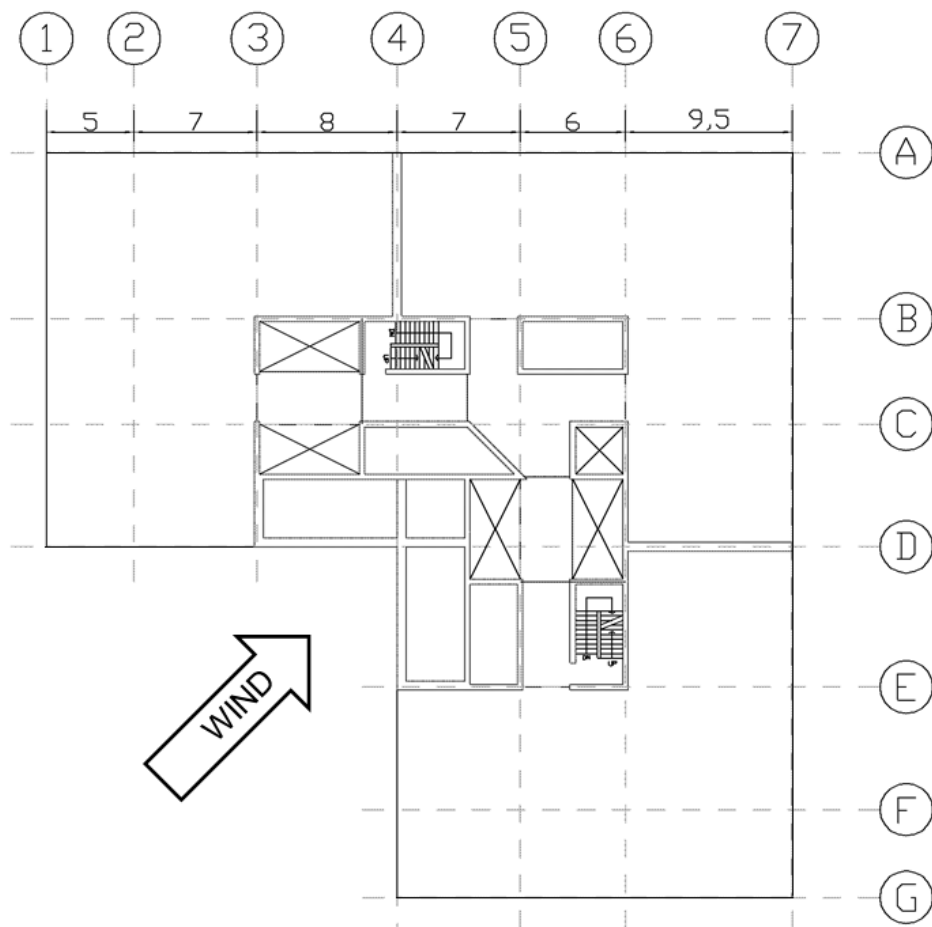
Typical floor plan of irregular tall building (dimensions in metres)
